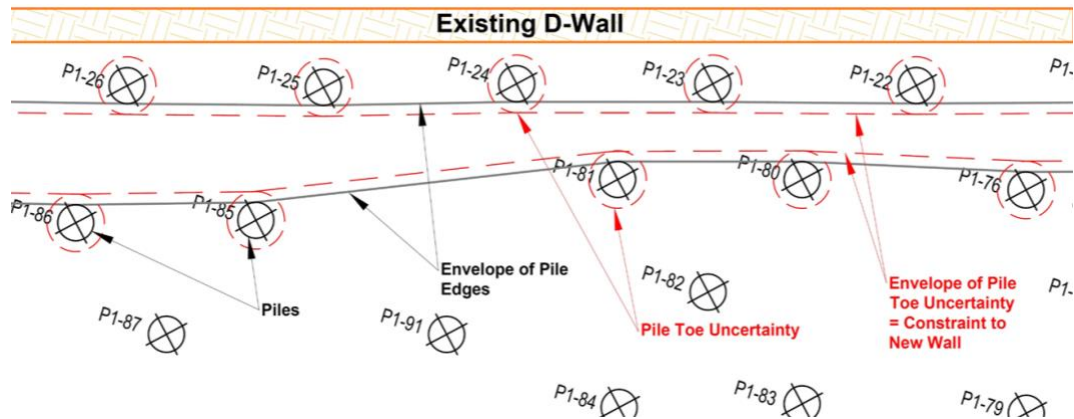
Assessment of scope for location of new wall based on verticality of existing piles.
